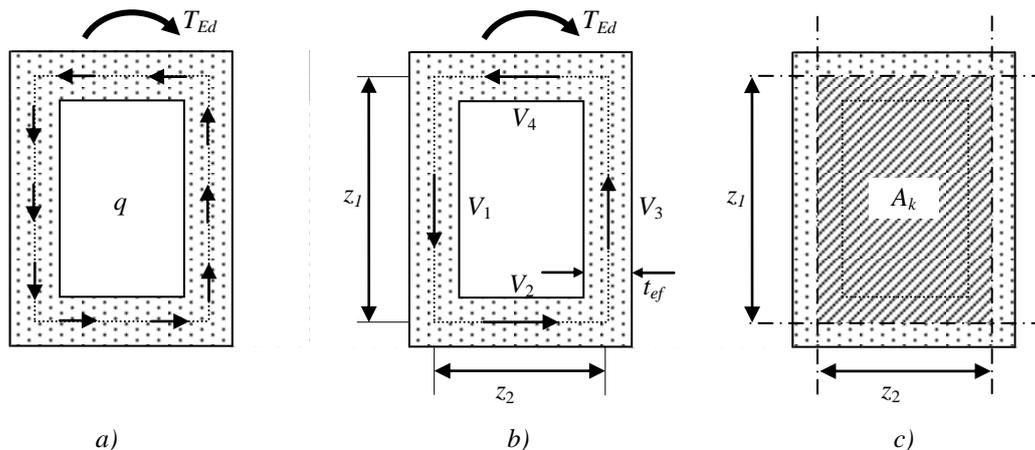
Rectangular cross-section where the shear flow, q , due to torsion can be seen as shear forces V_1 , V_2 , V_3 and V_4 acting in each wall of a hollow box section.
